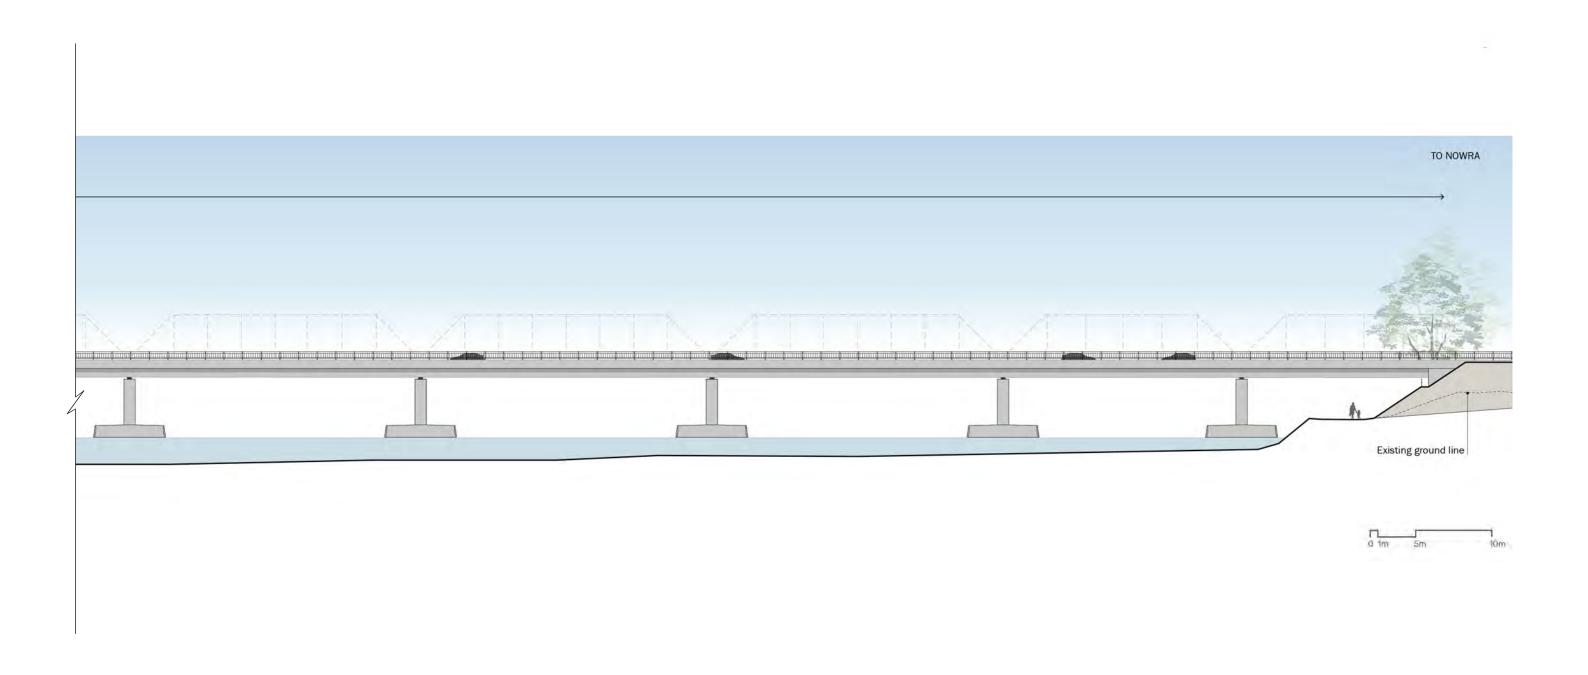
Elevation of bridge over Shoalhaven River - (Scale 1:500) Note: Subject to further design development and consultation.
